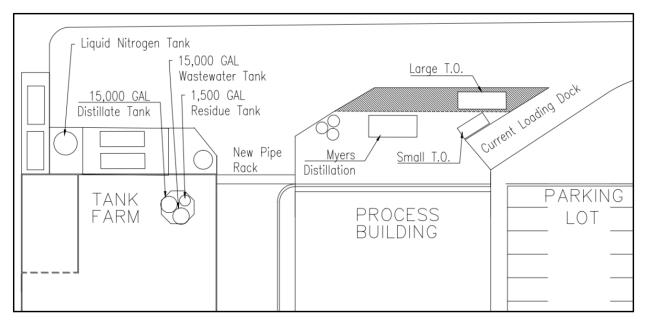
Proposed Site Plan for Distillation Systems at Ever Cat Fuels
